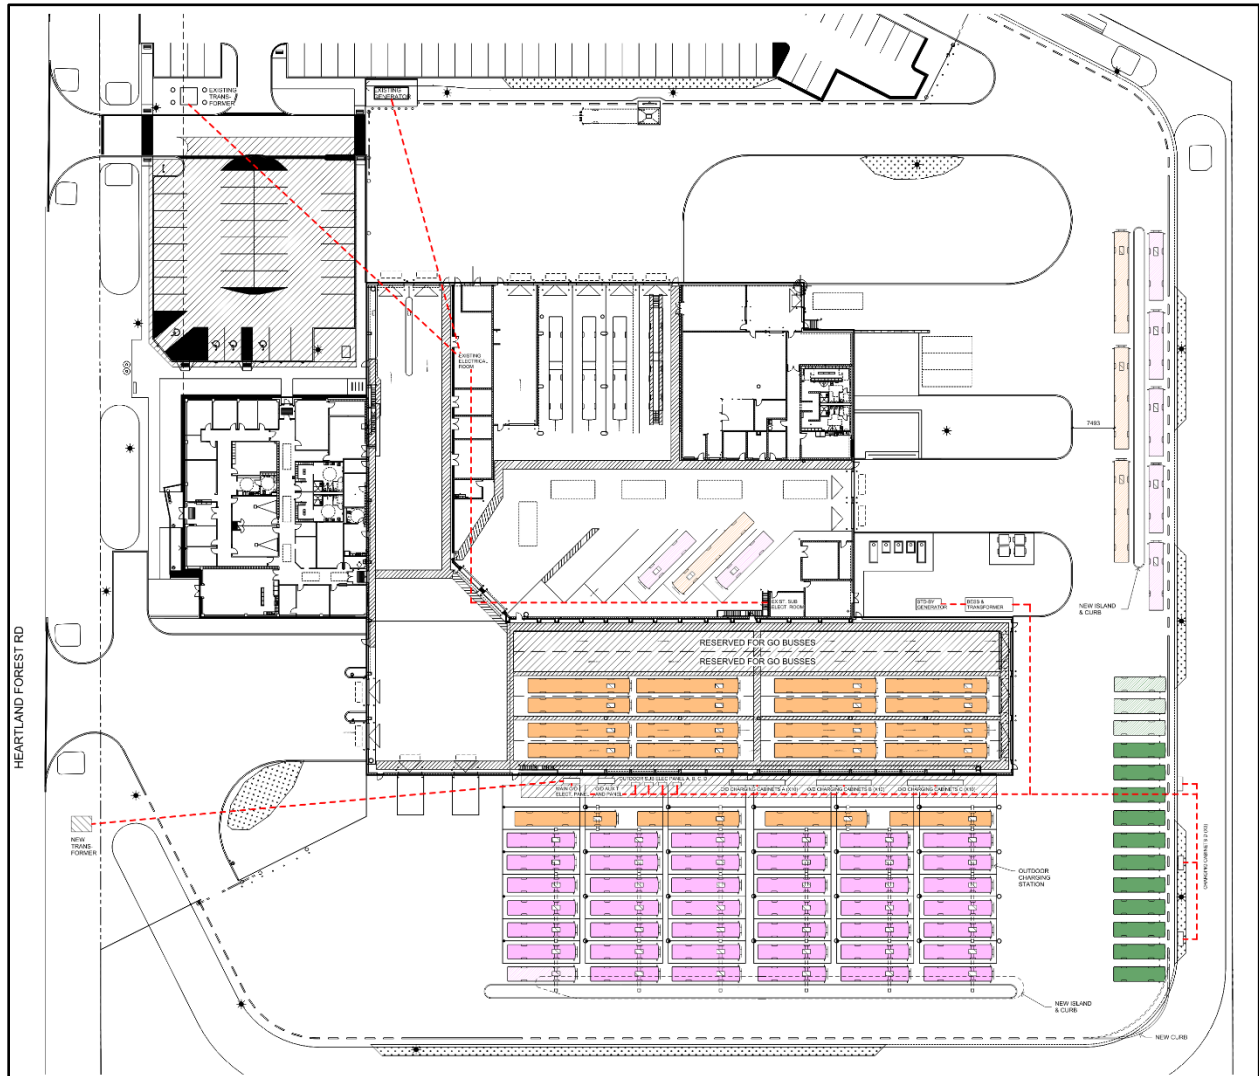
Proposed Niagara BEB Facility Site Plan.
